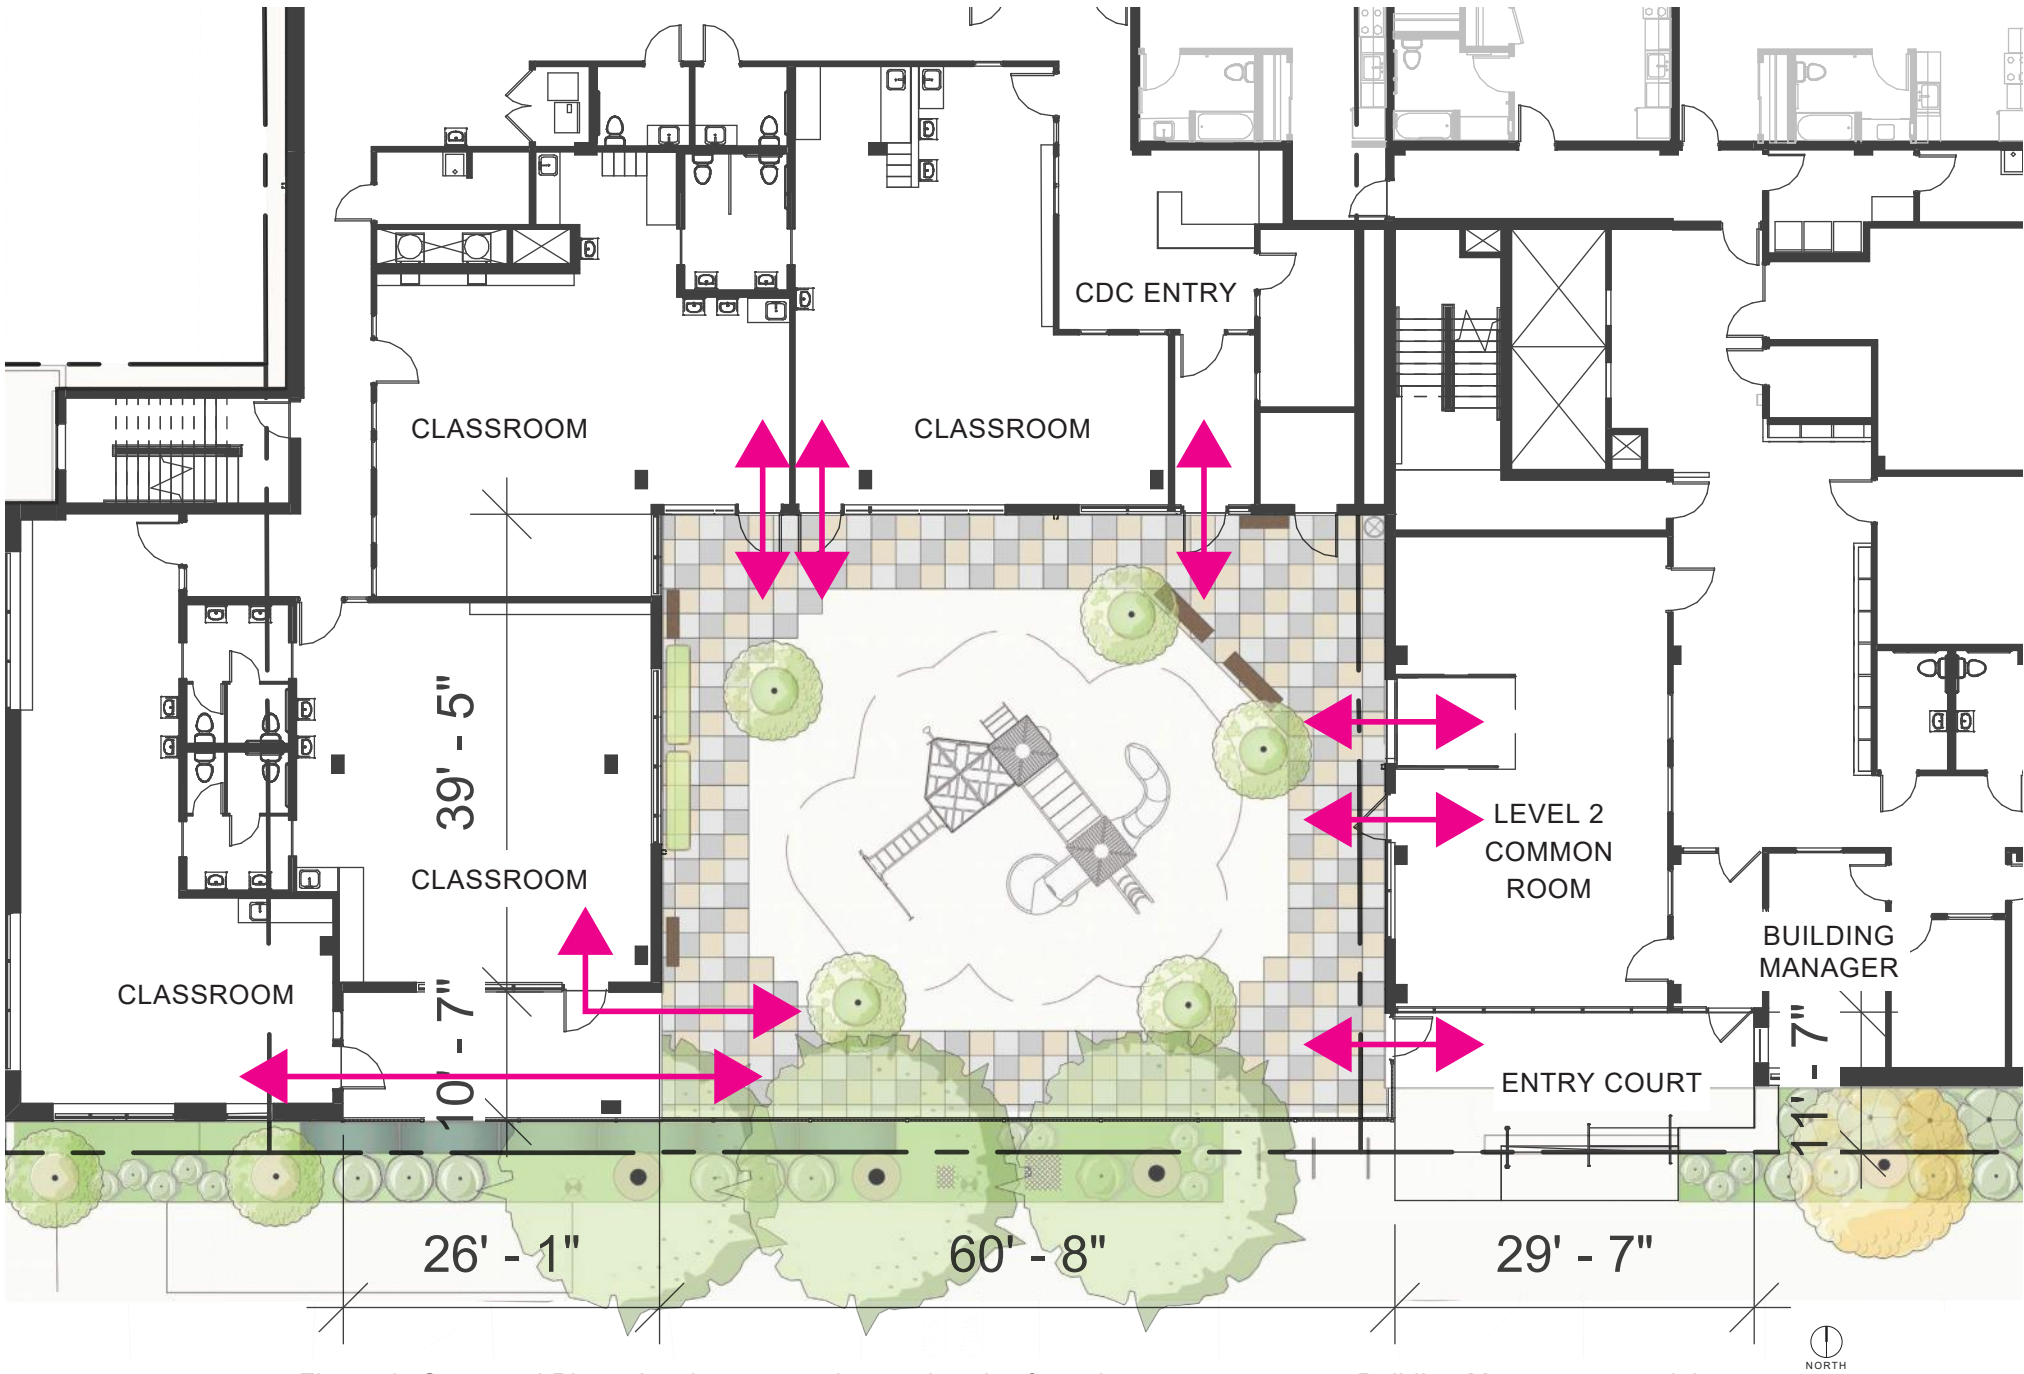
Courtyard Plan, showing connections to interior & exterior program spaces, Building Manager supervision
